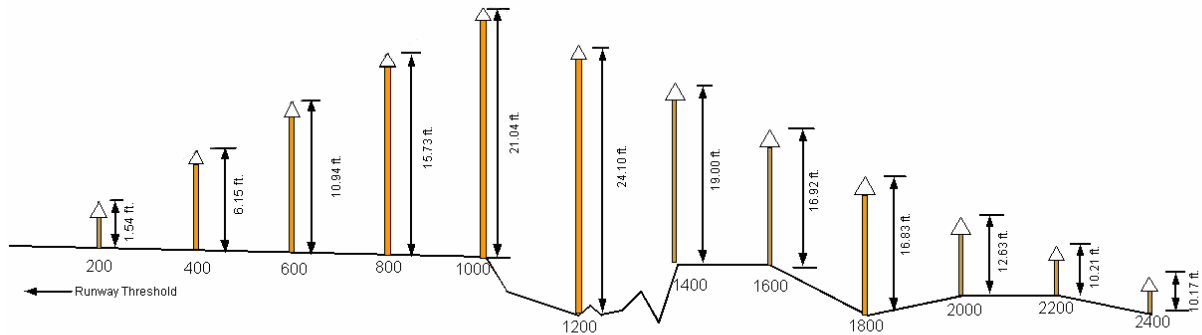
The ASALS Side View Showing Vertical Profile of Installed Towers
